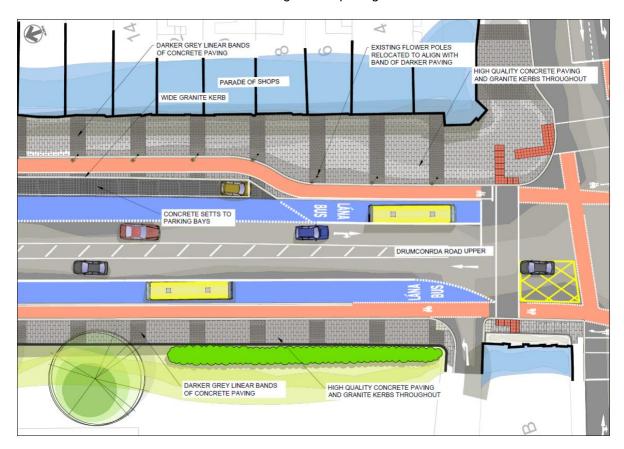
Drumcondra Road Upper Shopping Parade Indicative Design
